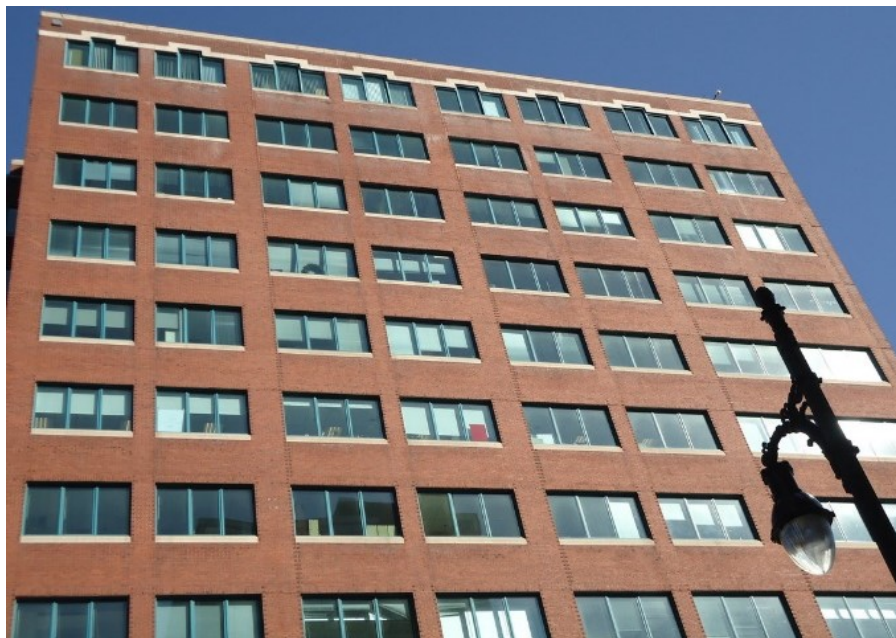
Photo of the north-west façade of FB Building with driving rain gauge
